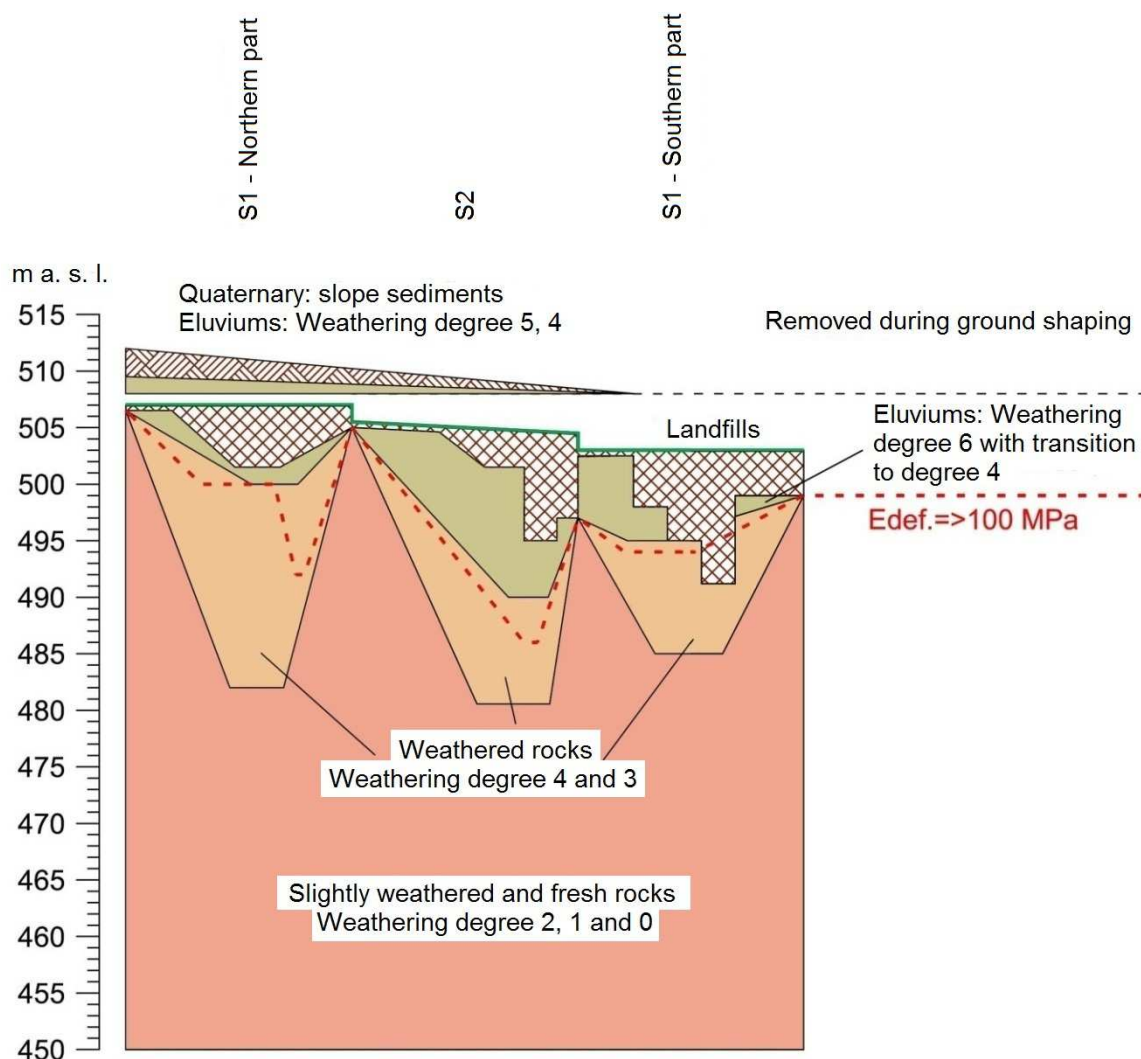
Schematized "profile" of the foundation soil for S1 and S2 areas of the ETE3,4 construction site.
